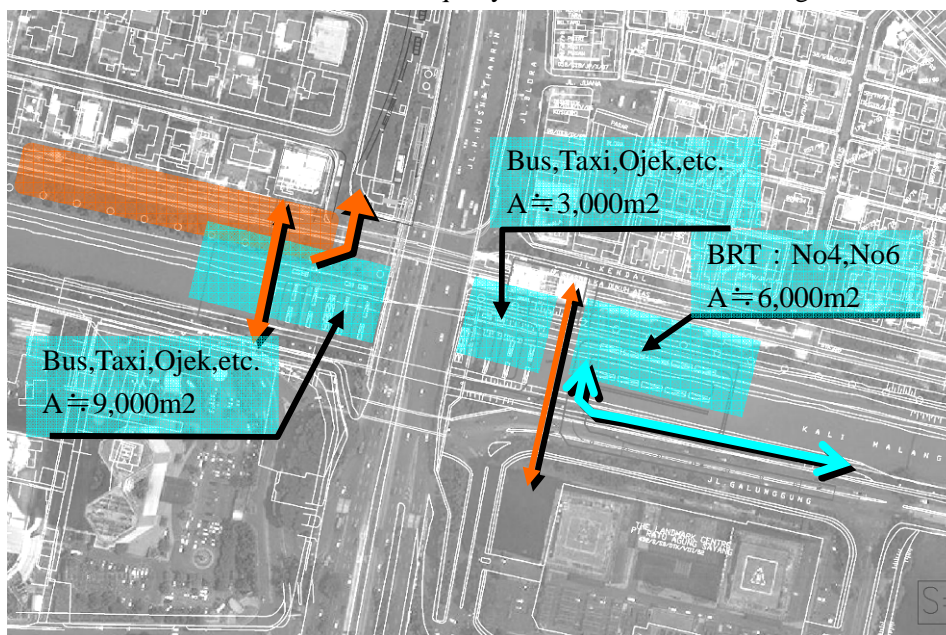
Scope of Artificial Ground Construction (Source : Study Team)
